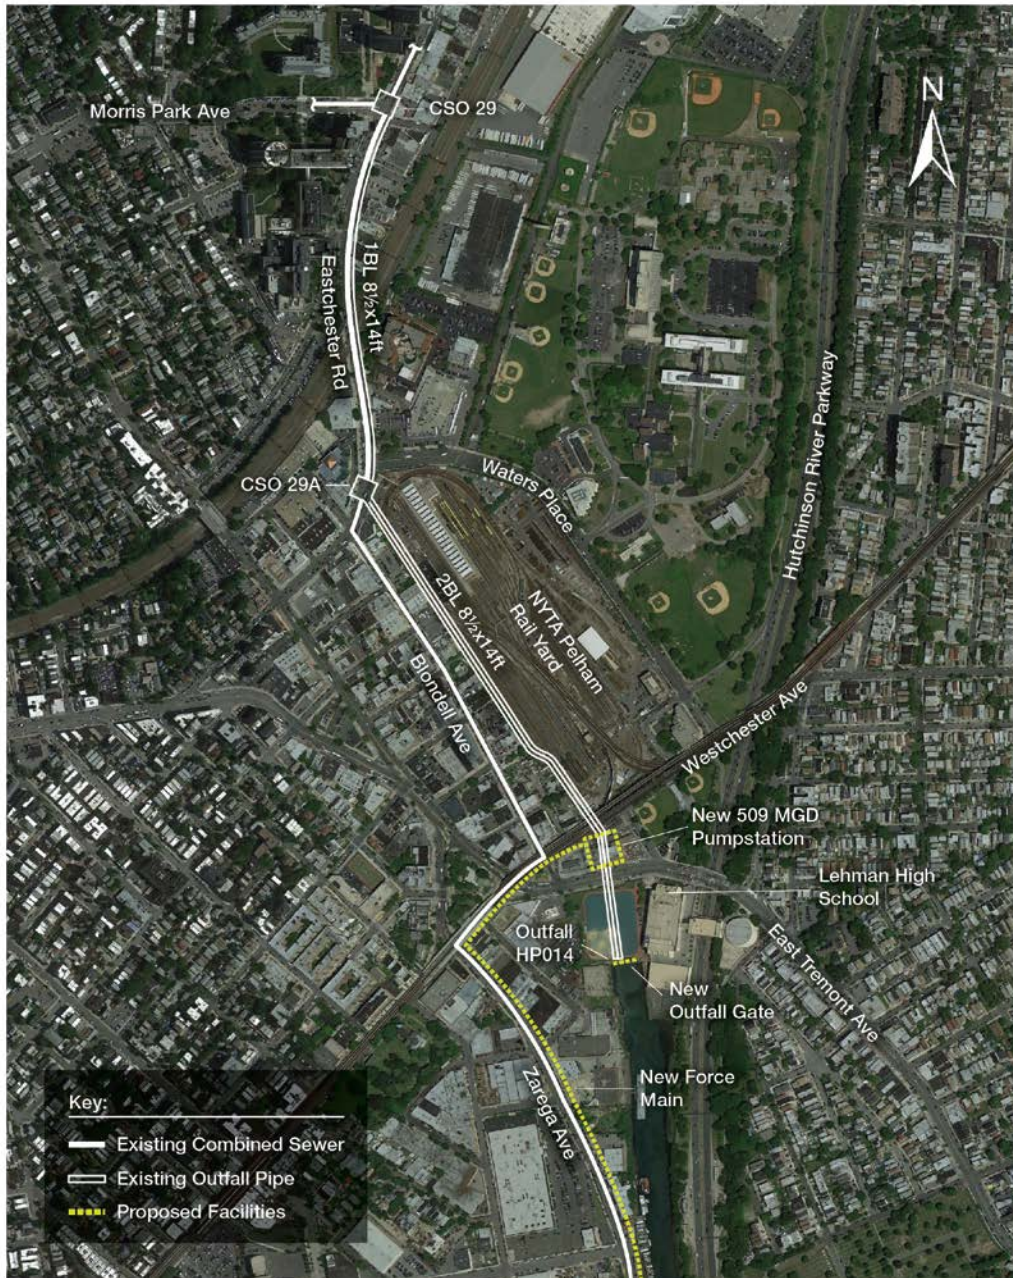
Layout of Inline Storage at Outfall HP-014
